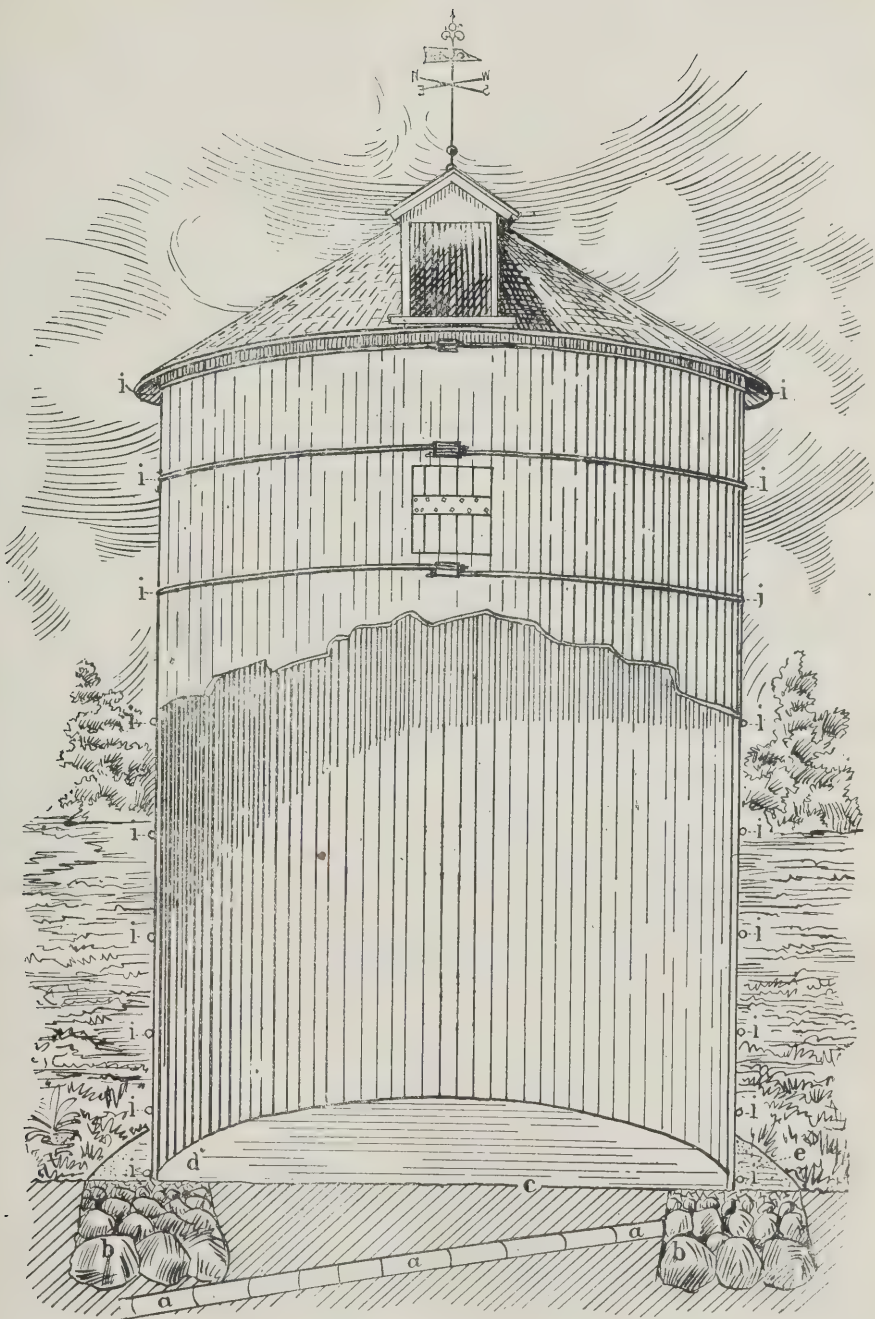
Longitudinal section of Stave Silo, showing: *a a a*, drain; *b*, foundation; *c*, ground floor; *d*, cement floor inside; *e*, cement floor outside; *i i i*, etc., hoops.
